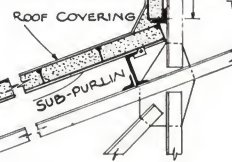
DETAIL SHOWING USE OF LIGHT JOISTS IN PLACE OF SUB-PURLINS
